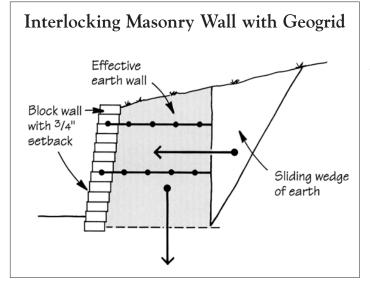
With interlocking masonry walls 4 feet and higher, a geogrid fabric is used to reinforce the retained soil, creating an "effective" earth wall that reinforces the masonry wall.
